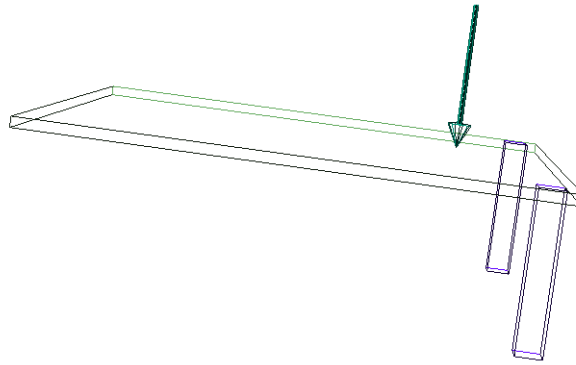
VIEW OF SLAB SHOWING THE ECCENTRIC LOAD
